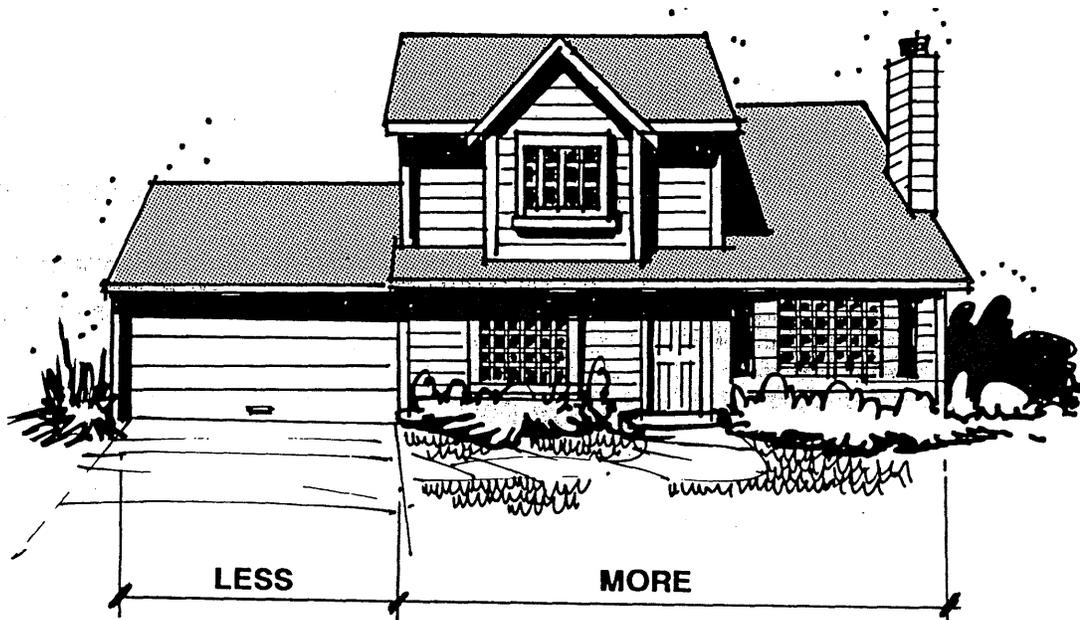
Recommended decrease in width of garage doors and increase living area facing street.
